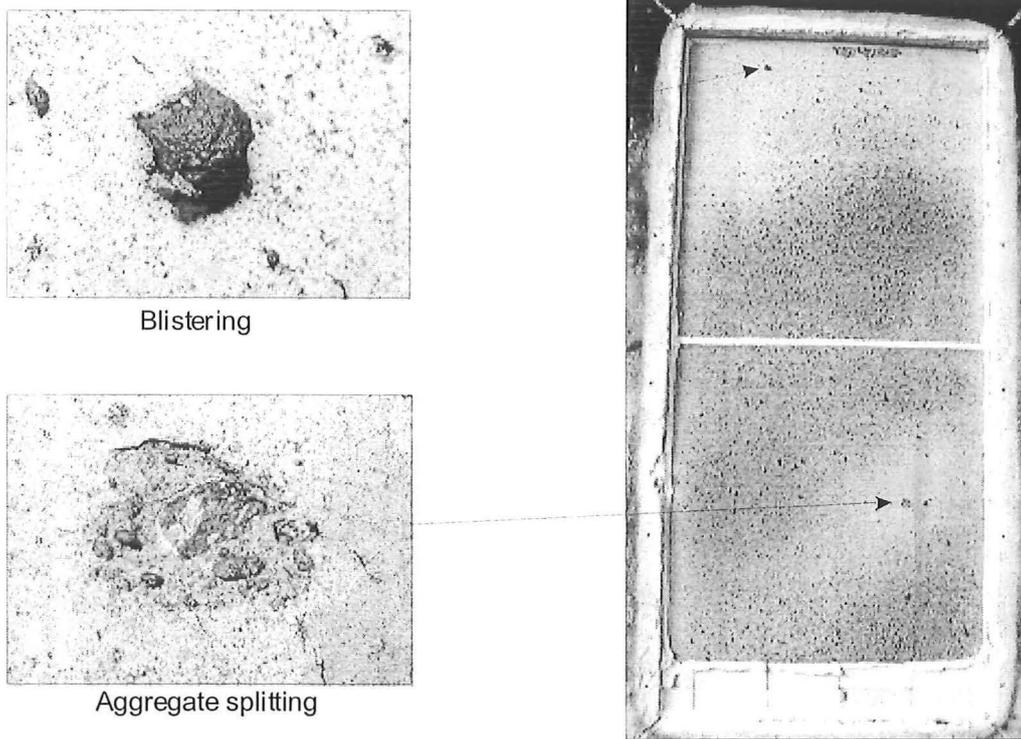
Blistering and aggregate splitting on exposed face of 130mm lightweight slab
